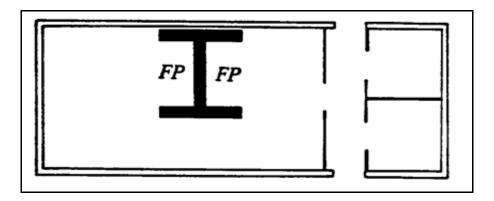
Cross Passage Plan House with Unheated Lower Room (from Neiman 1990:261).
